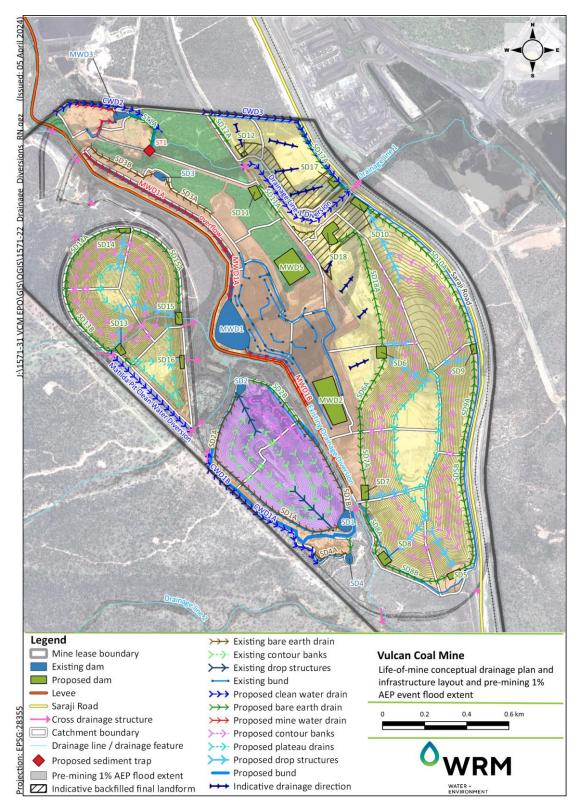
LOM (post-mining) conceptual drainage plan and infrastructure layout
